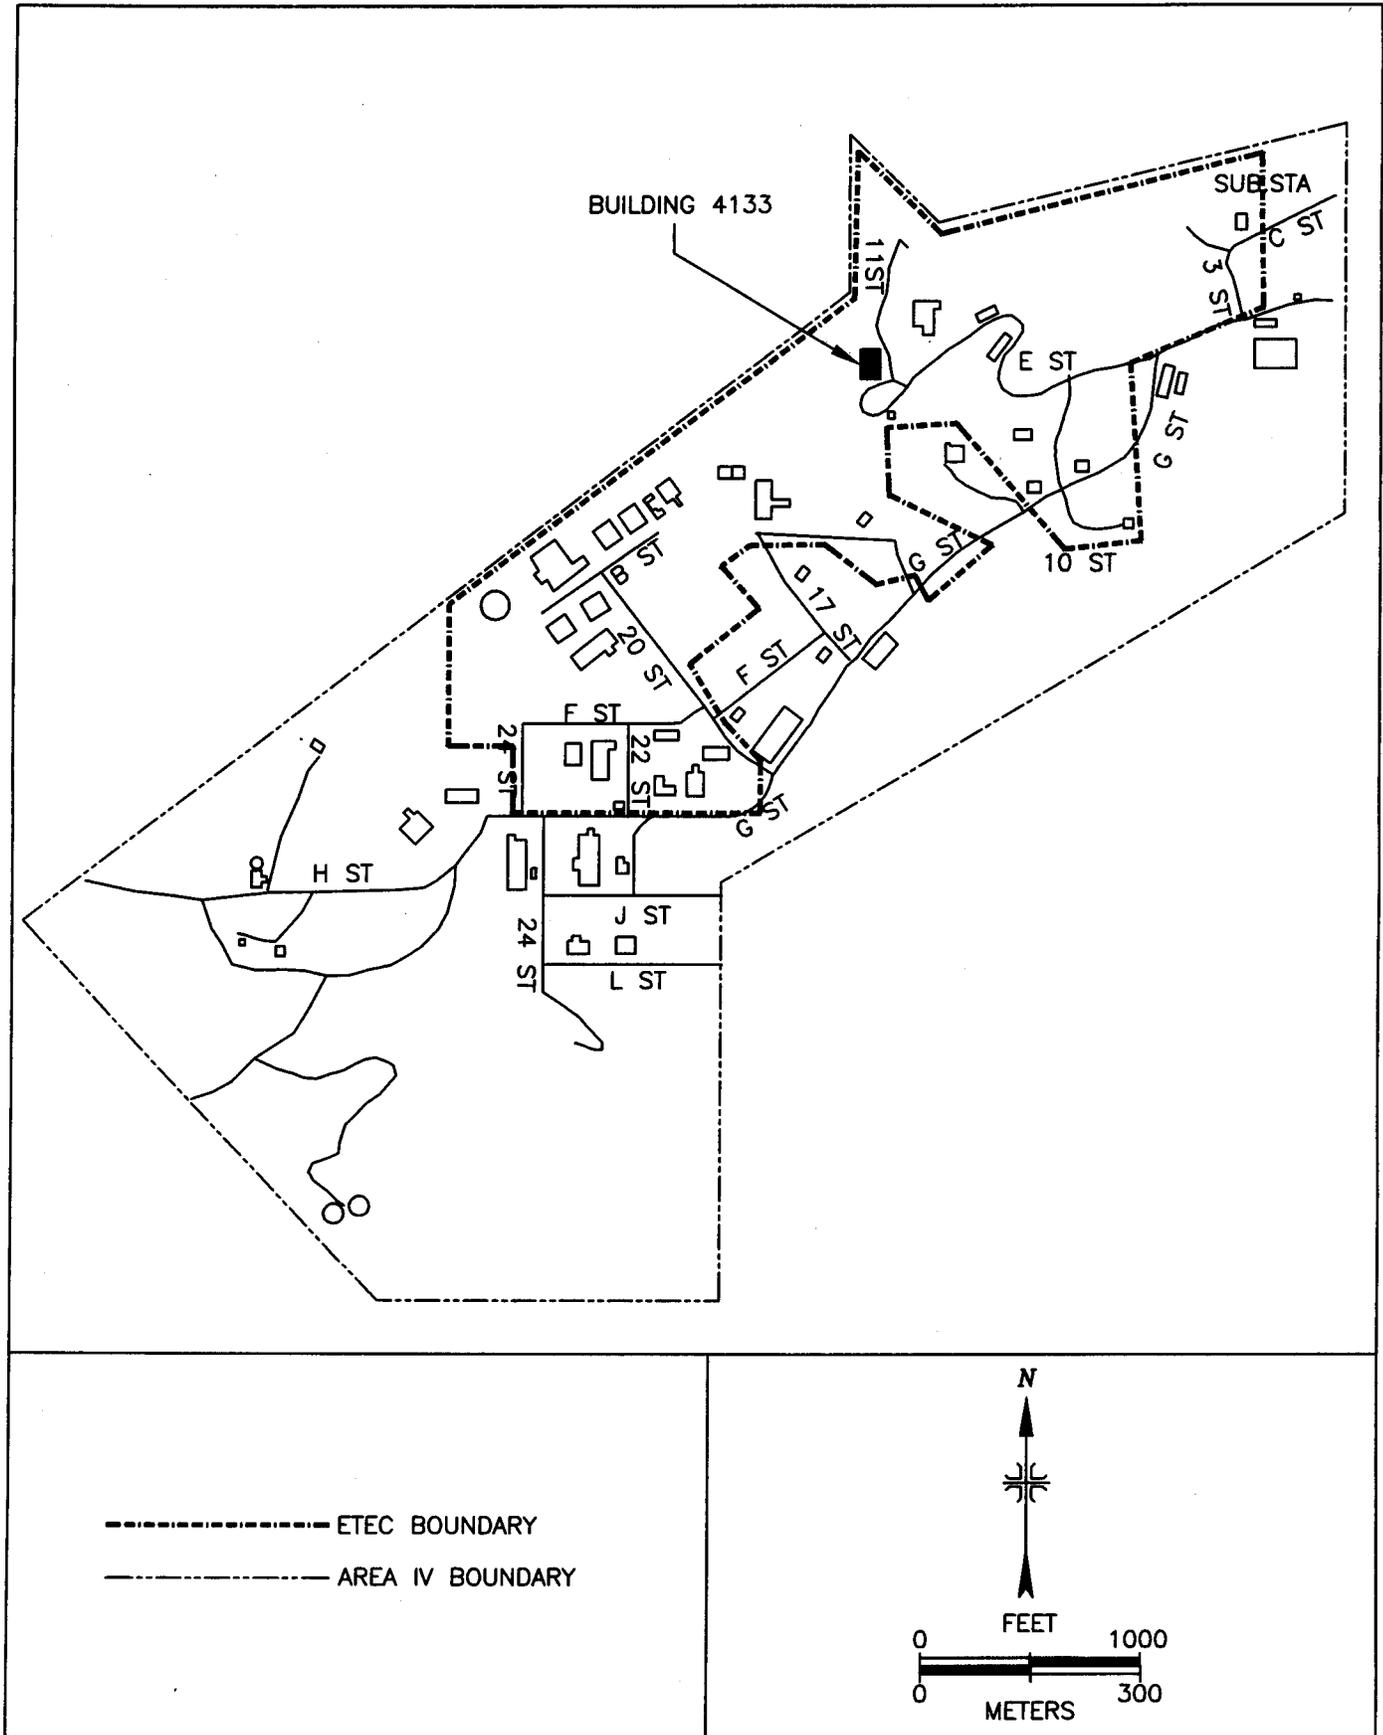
Santa Susana Field Laboratory Area IV, Plot Plan – Location of Building 4133
